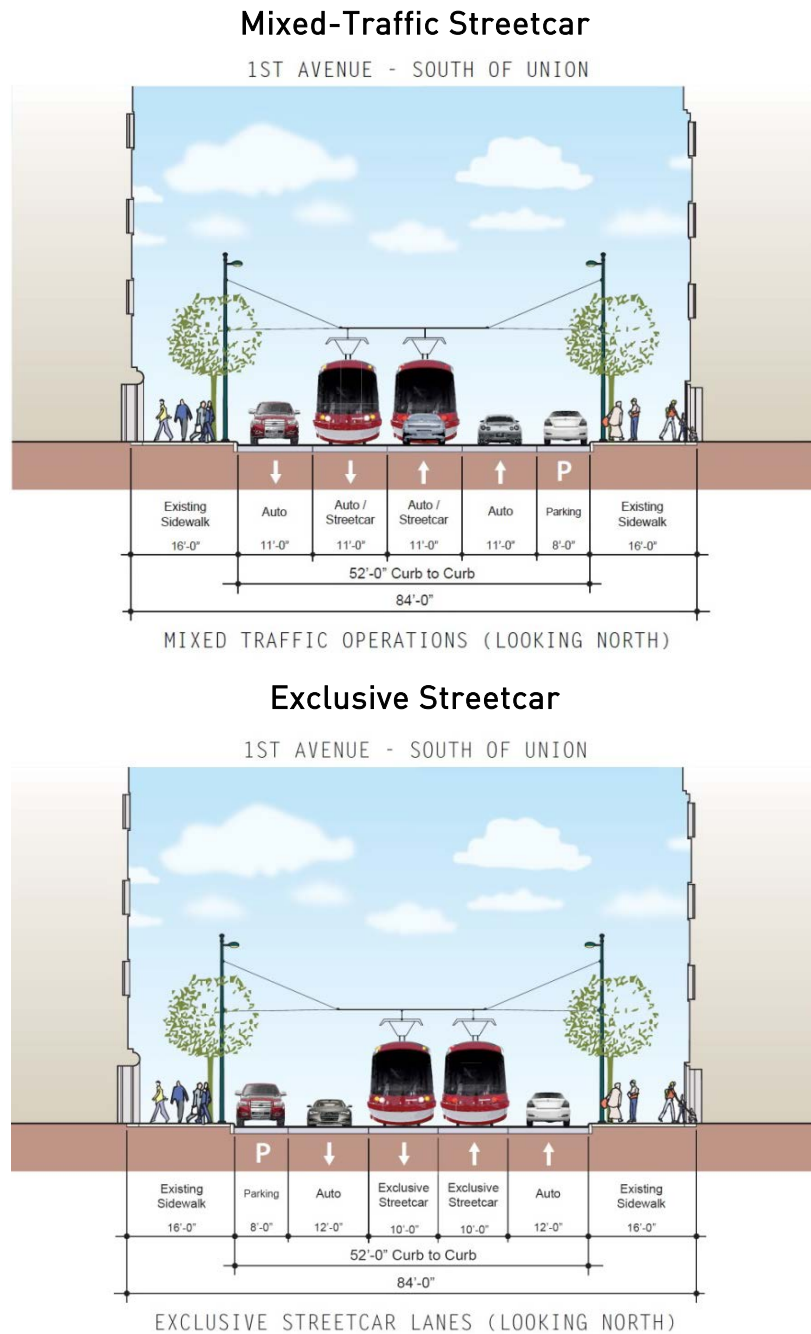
Typical 1st Avenue Cross Section between Stops
